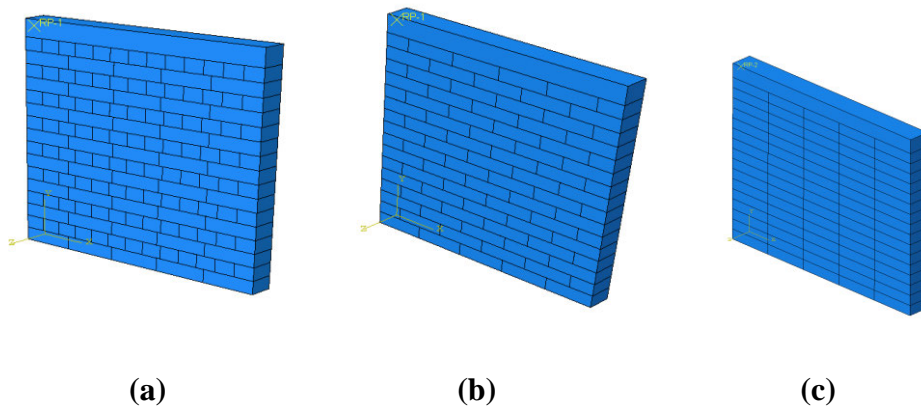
Numerical Model of Masonry wall in ABAQUS: (a) English bond; (b) Stretcher bond; (c) Stack bond
